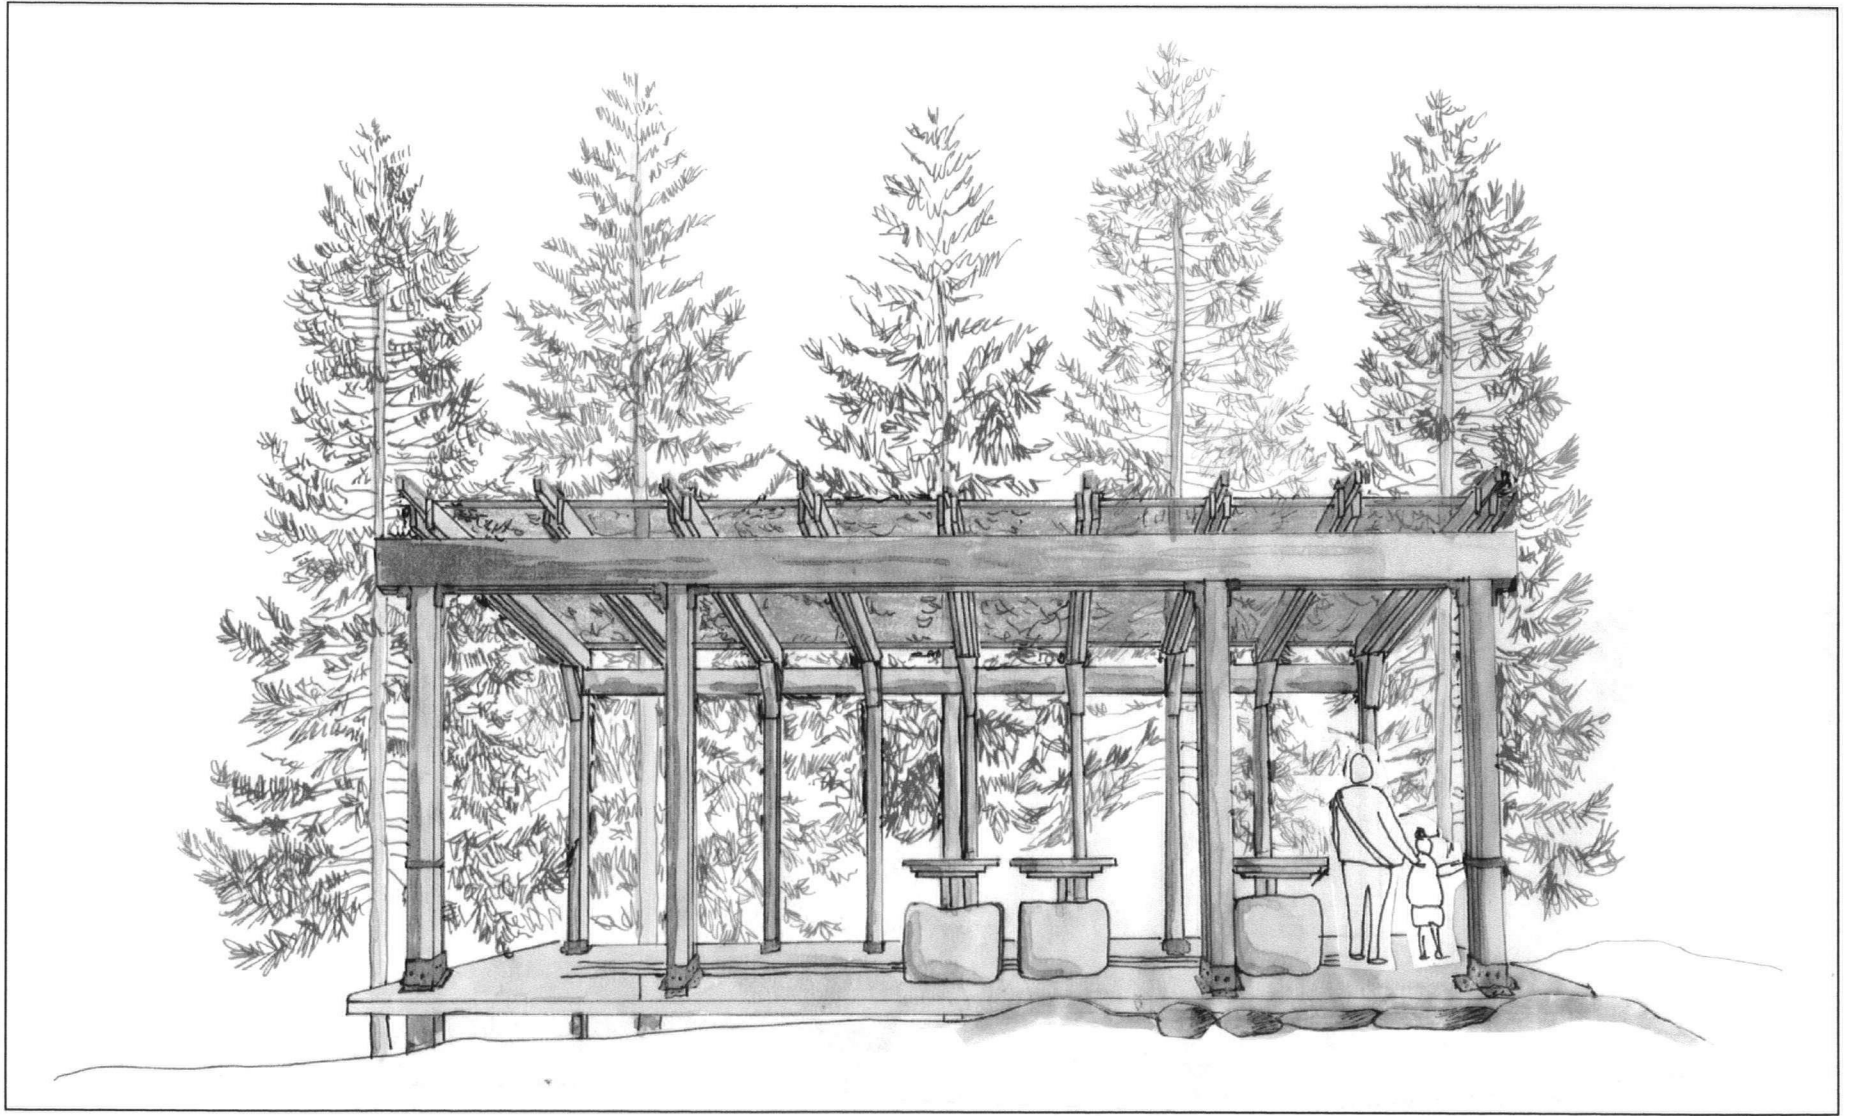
The main picnic shelter at Lone Tree Mountain. Pillars designed to mimic the forest backdrop with flooring and shelter hooked into its surrounding landscape.
